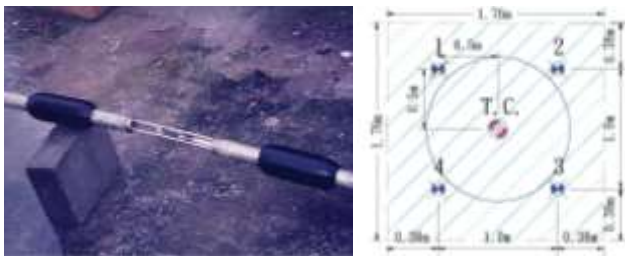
The double packer and layout of grouting and test holes for piling protection (CYC, 2014)
